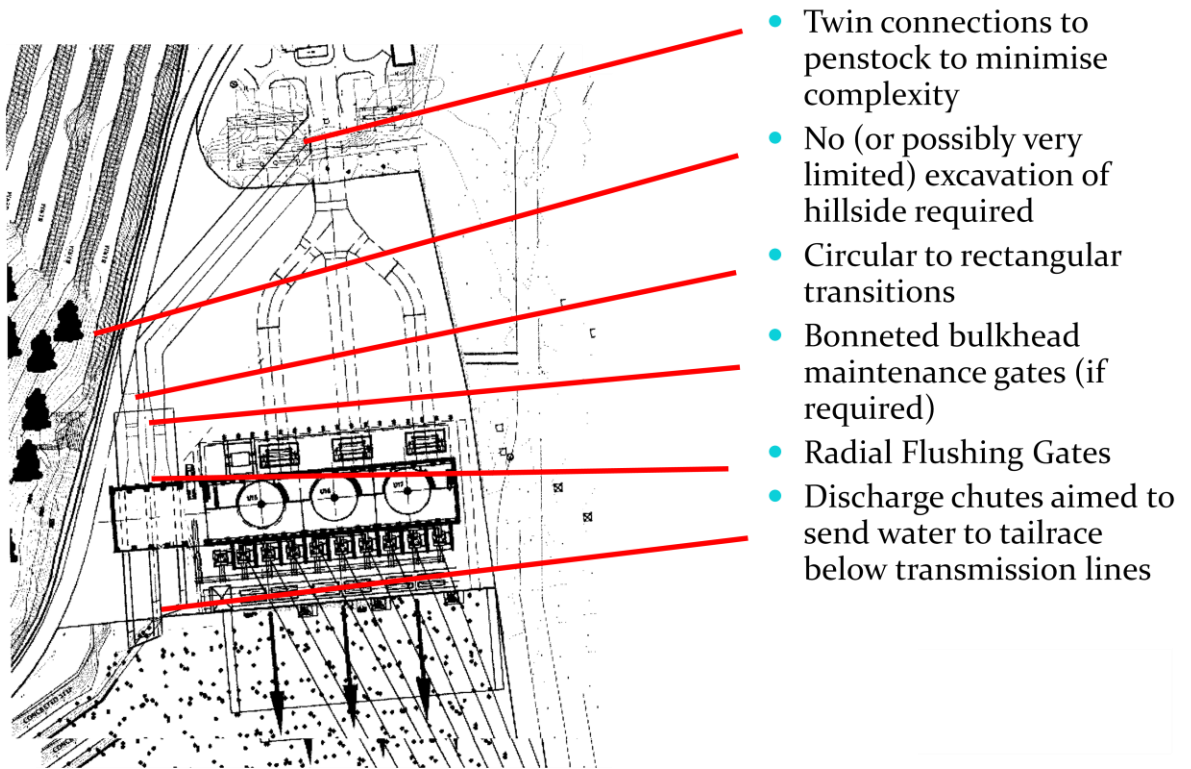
(c): Powerhouse Layout with Flushing Gates
